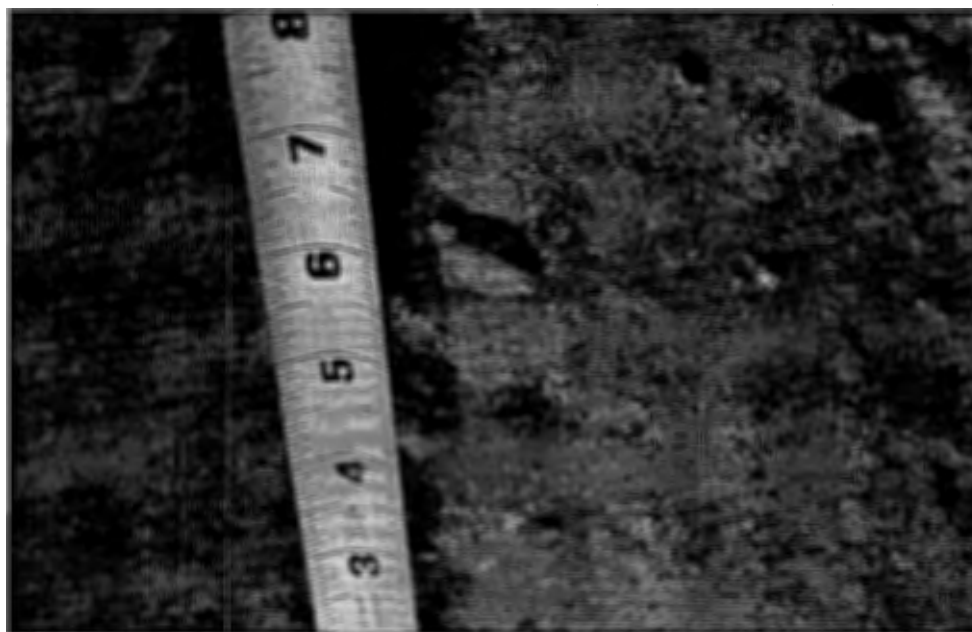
The pipe segment possessed many notable pits on its ID wall.
